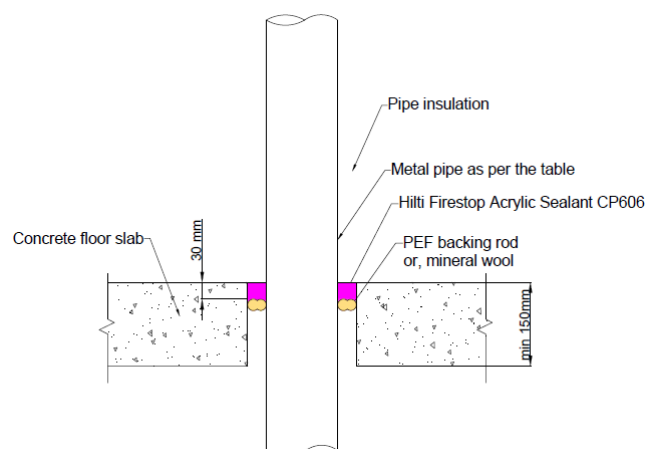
Side view – 120 mins FRL rigid floor system with or without mineral stone wool
